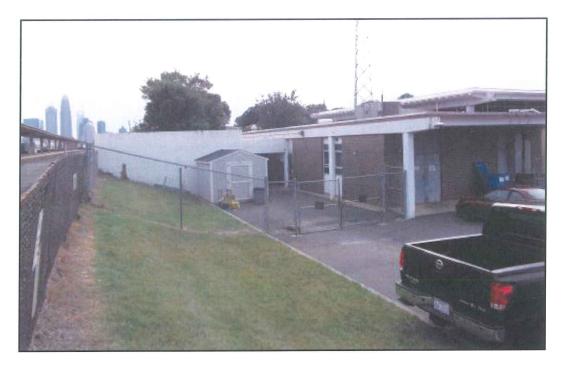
View of the east and south elevation, and tunnel portion, facing west
